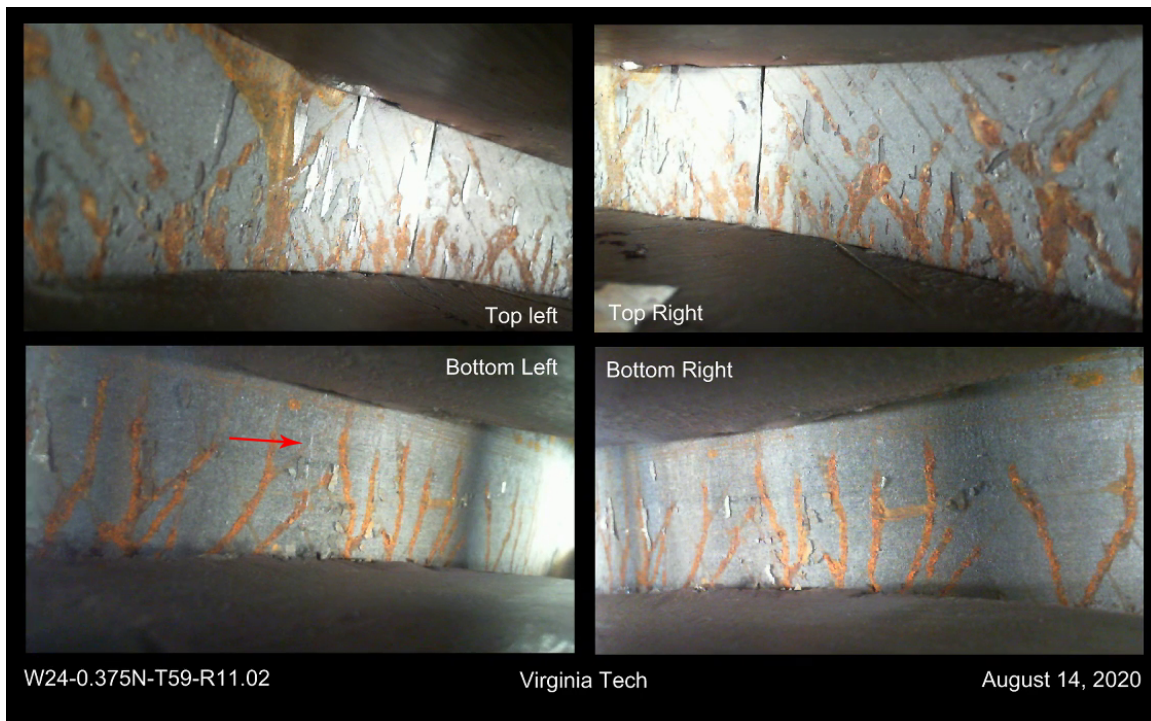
Fracture initiation of W24-0.375N-T59-R11.01.
